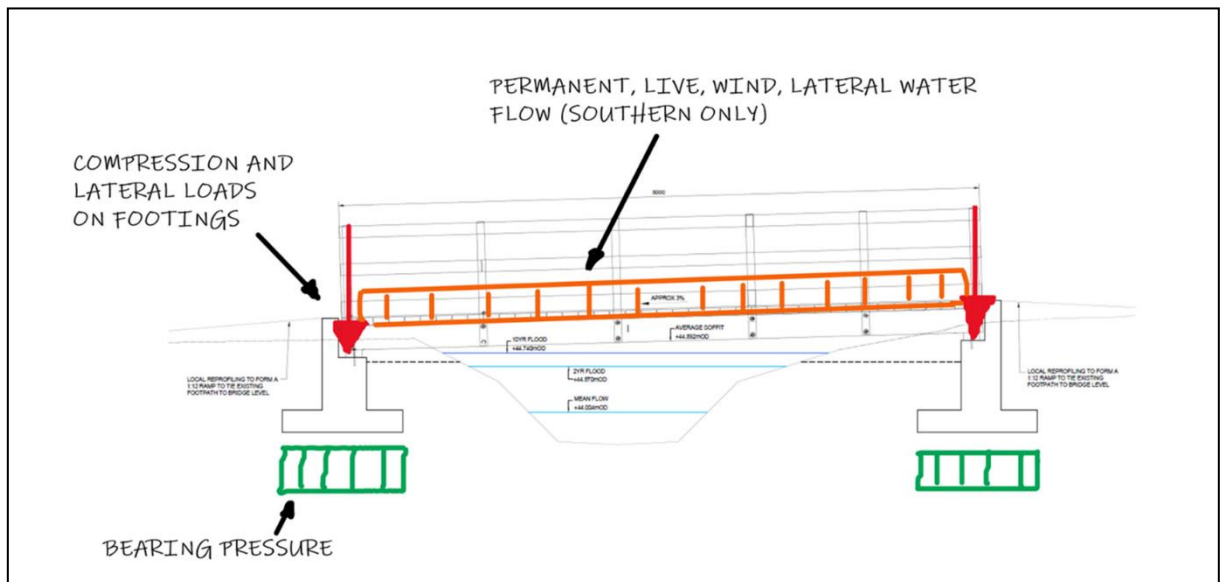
Idealised load diagram for bridge structure, flow control structure and foundation loading
